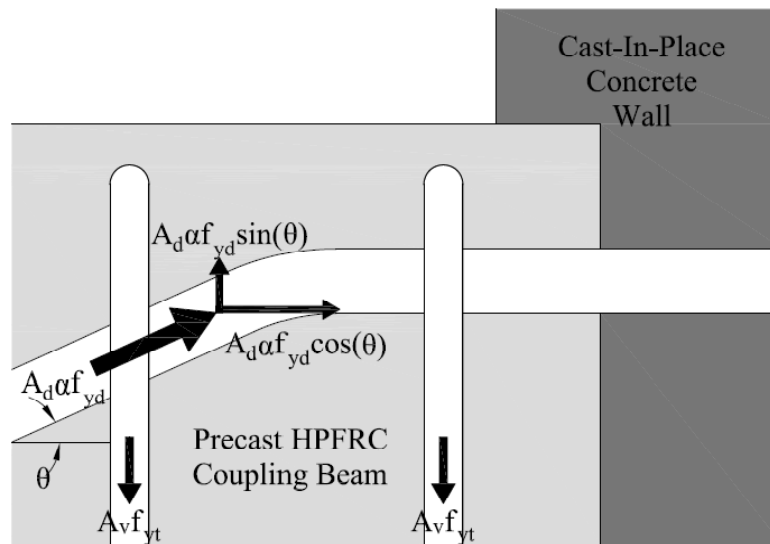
Forces in steel reinforcement near the bent-diagonal detail
